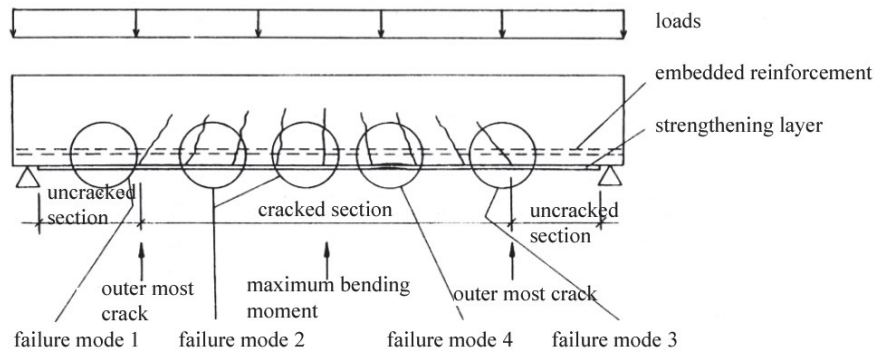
Bond failure modes of flexural strengthened concrete [4]
